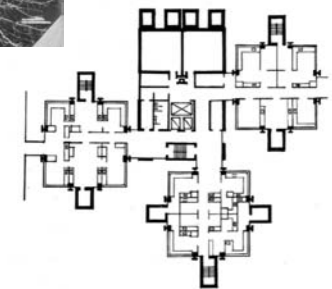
Richards Medical Building -typical floor plan showing variable layouts.
